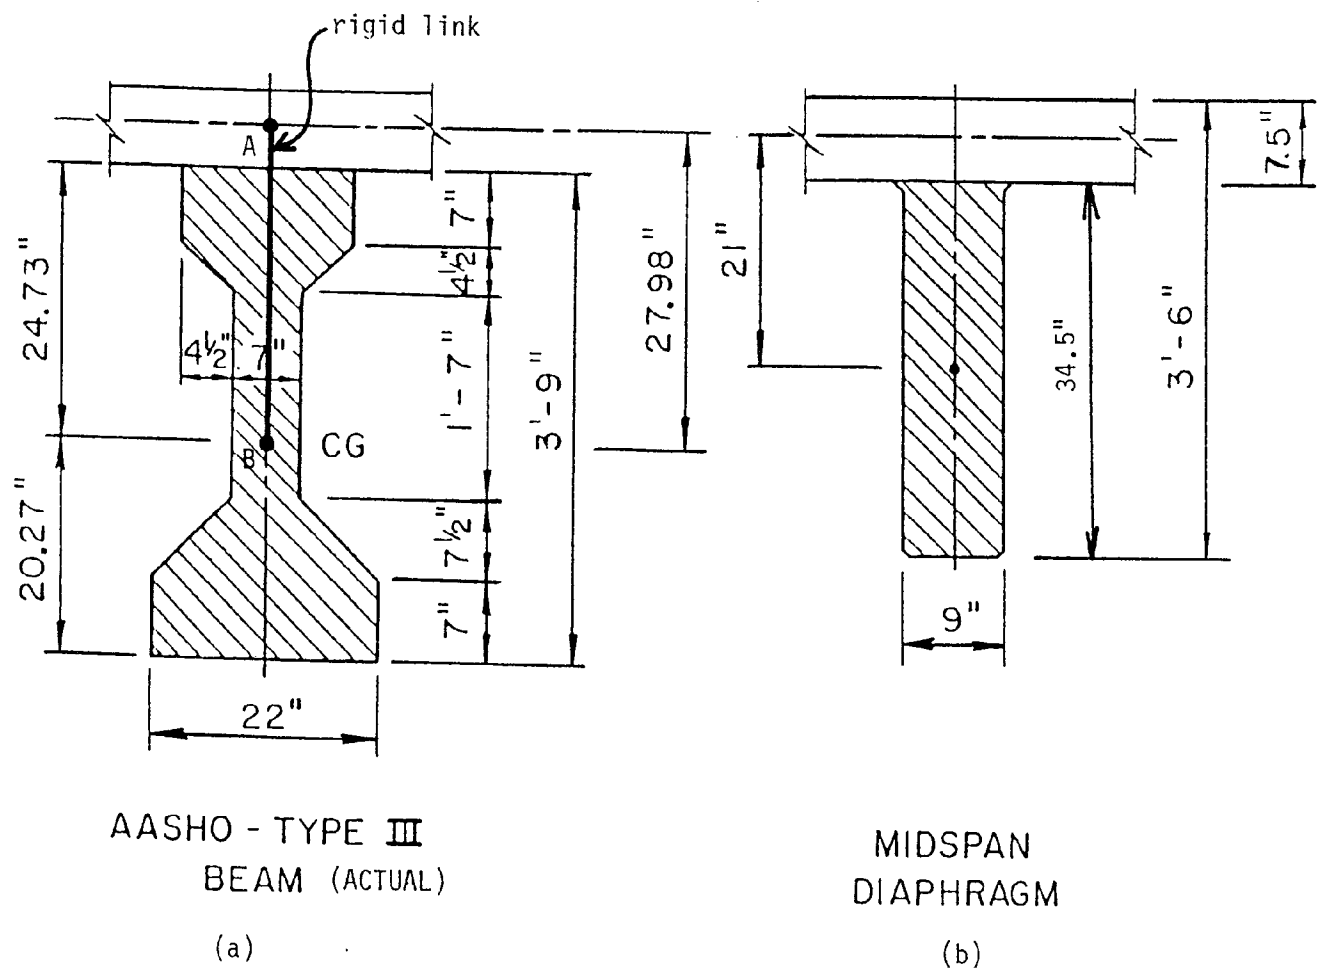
Cross-sections of bridge girders and diaphragms, and rigid link AB.
